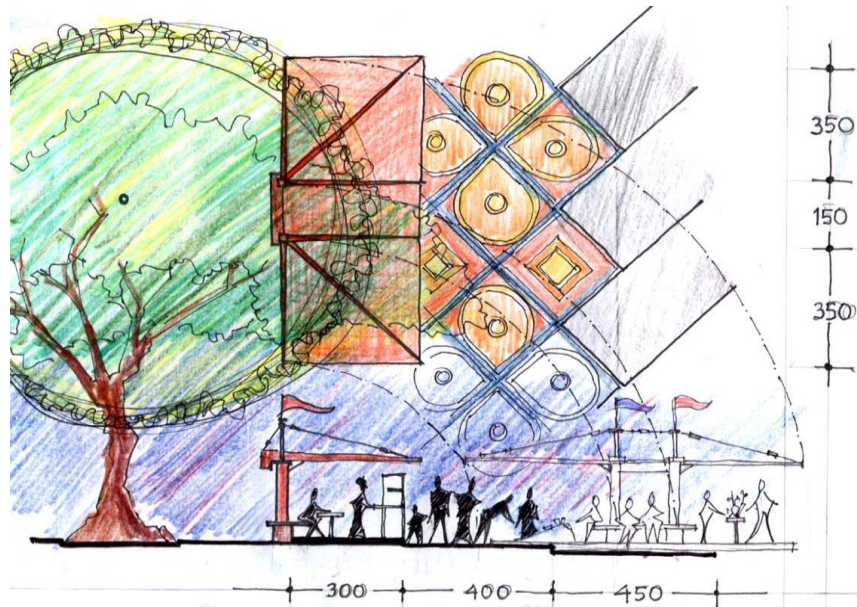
The sketch of plan and section of sitting area that has a shady tree or canopy to ensure comfort
